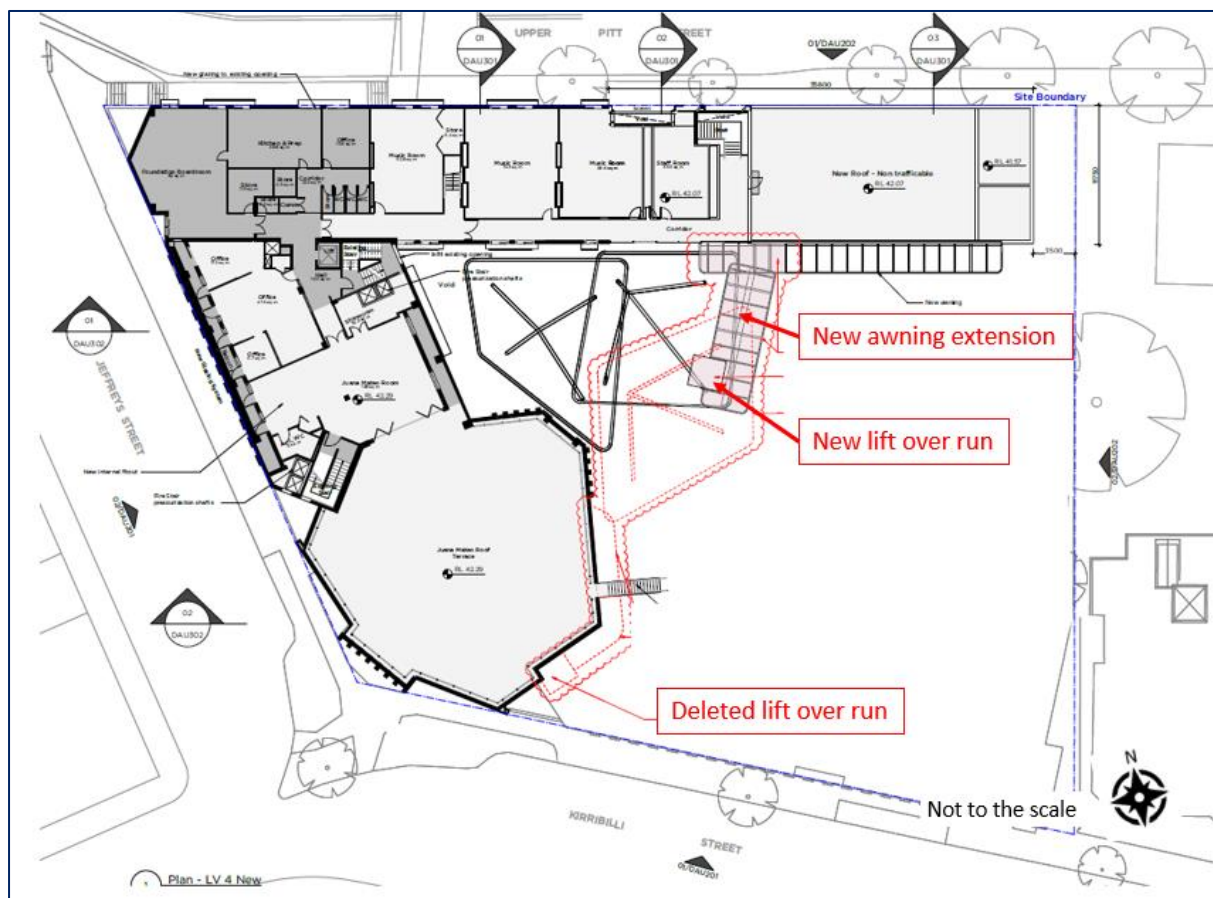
| Fourth floor modification (Source: Applicant's additional information 2023)
